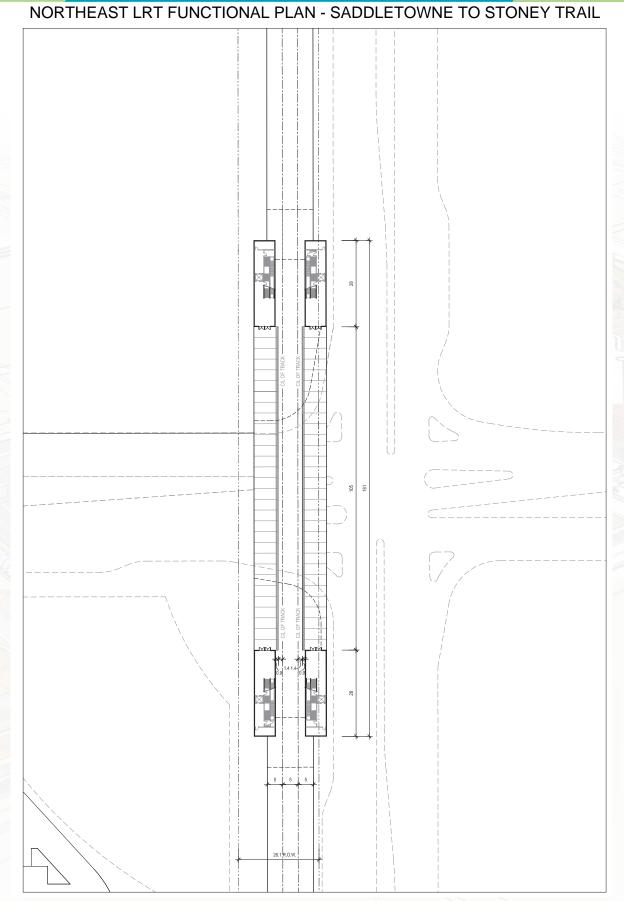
OUTLINE PLAN REVISION - OPTION 10
